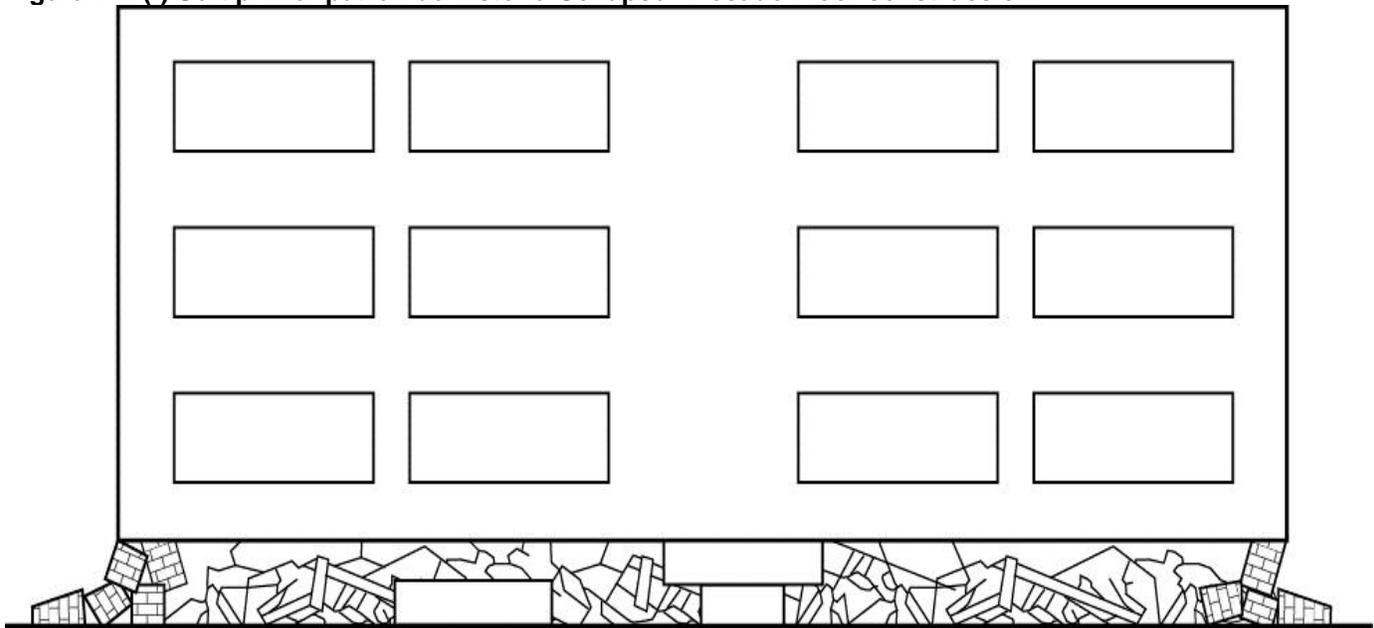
(g) Fall Random Collapse Pattern - Precast Concrete Construction.
